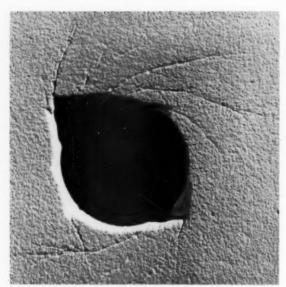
A photograph of model type R-10, showing opening 1.4 in. round. The model is square. Similar models have openings 0.5 in., 0.75 in., 1 in., and 2 in. round.
